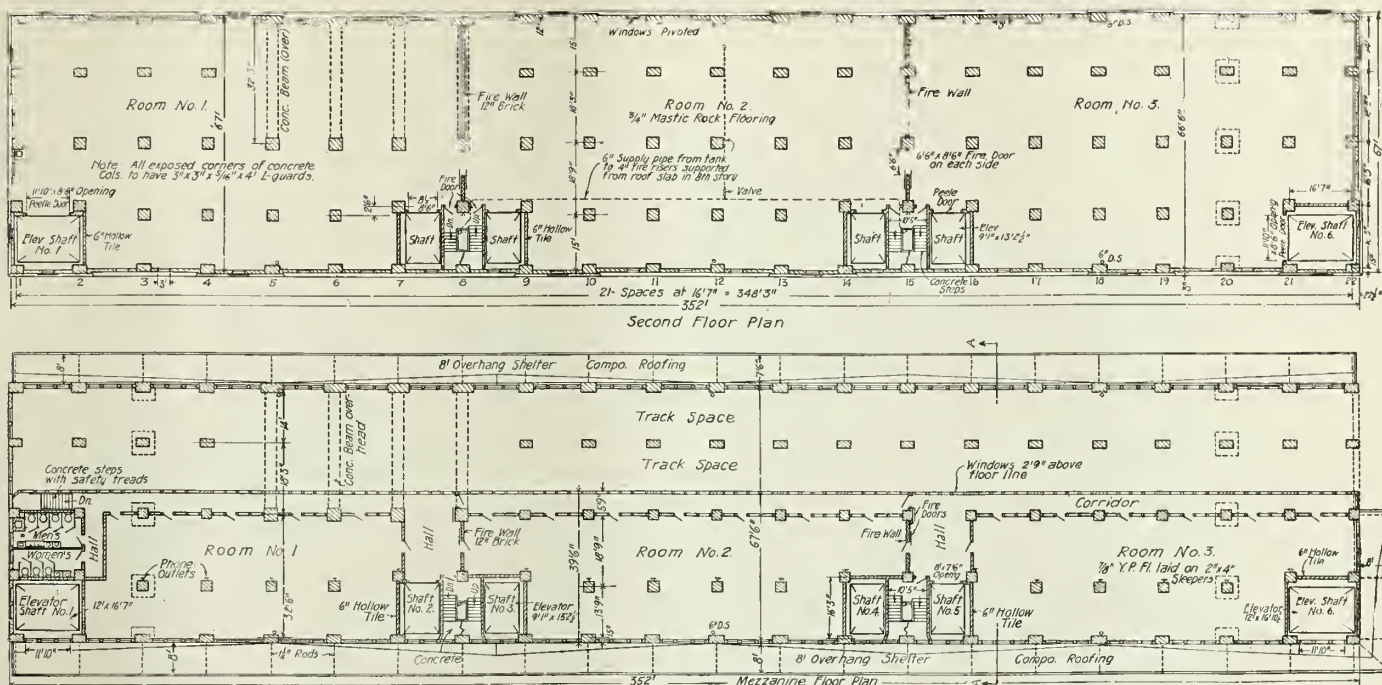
Plans of Second and Mezzanine Floors of B. & O. R. R. Terminal Warehouse in New York.
